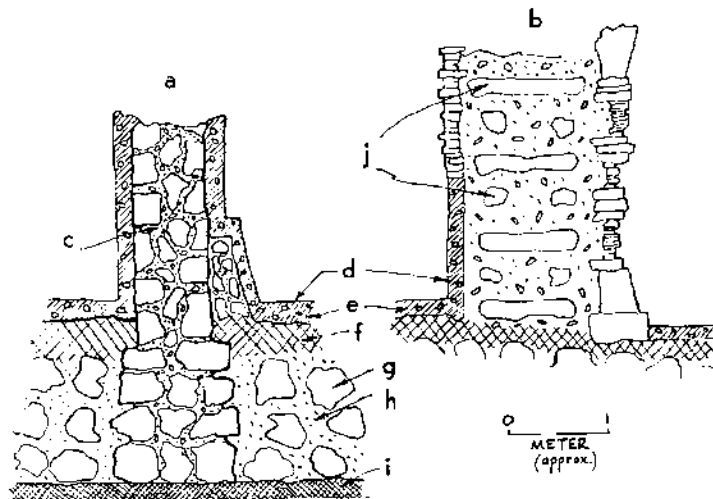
WALL CONSTRUCTION, TEOTIHUACAN AND MITLA. a, Teotihuacan, Mexico. b, Mitla, Oaxaca. c, Building stones set in clay and gravel, with a minimum of mortar. d, White-washed plaster. e, Concrete. f, Tepetate. g, Lava rock. h, Clay without gravel. i, Packed tepetate. i, Long roughly shaped stones, set in layers, alternating at right angles to each other.
